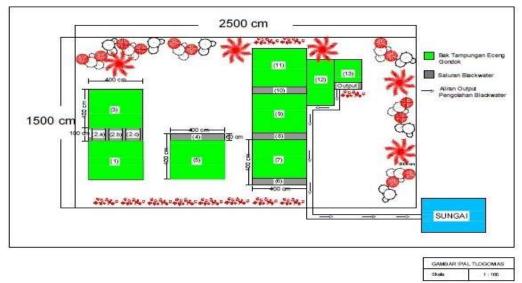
Site plan of communal wastewater plant (IPAL) Tlogomas Malang
